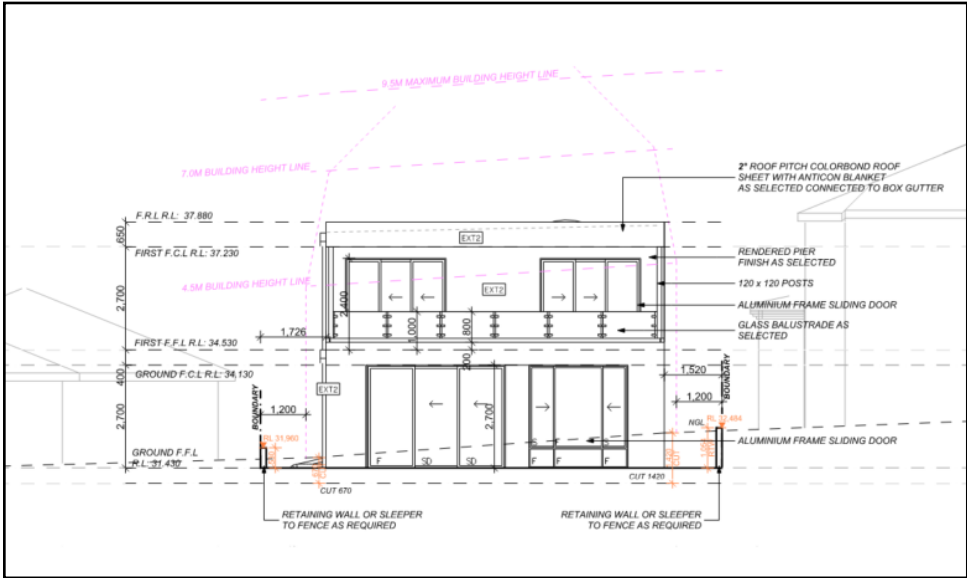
Rear elevation - demonstrating that the dwelling is compliant with side setback controls (Source: Prime Design)
